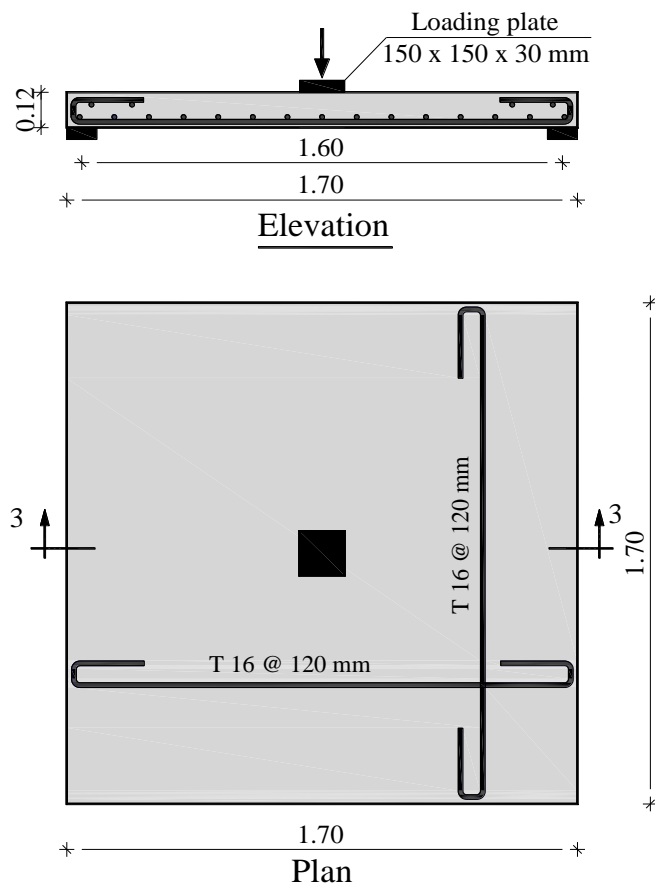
Reinforcement details for specimens of concentric loading (SC-0).
